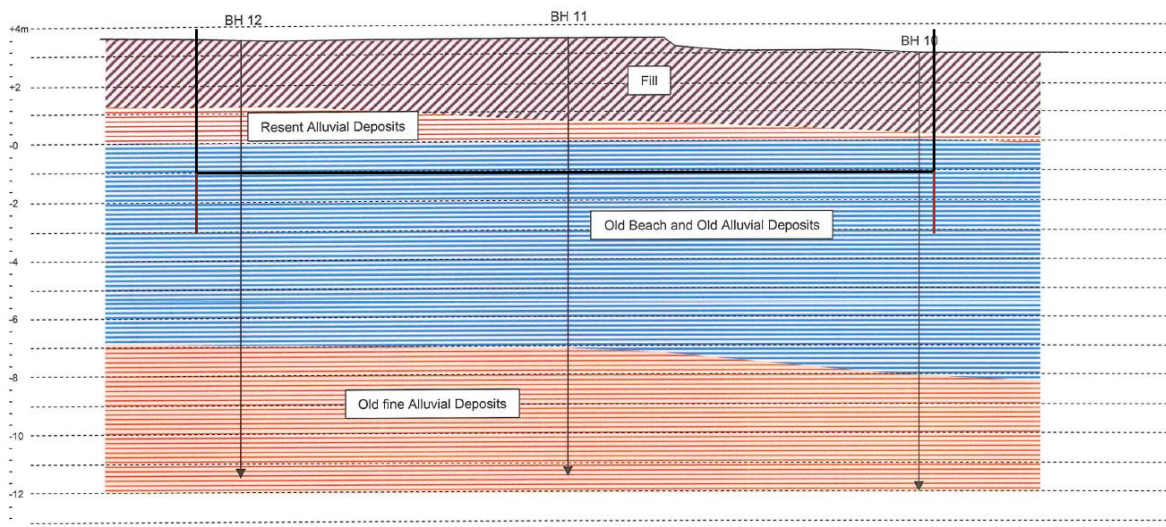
Geological Cross Section 4-4 (Geoinvest Dec.2014-Jan.2015), with Excavation and cut off
